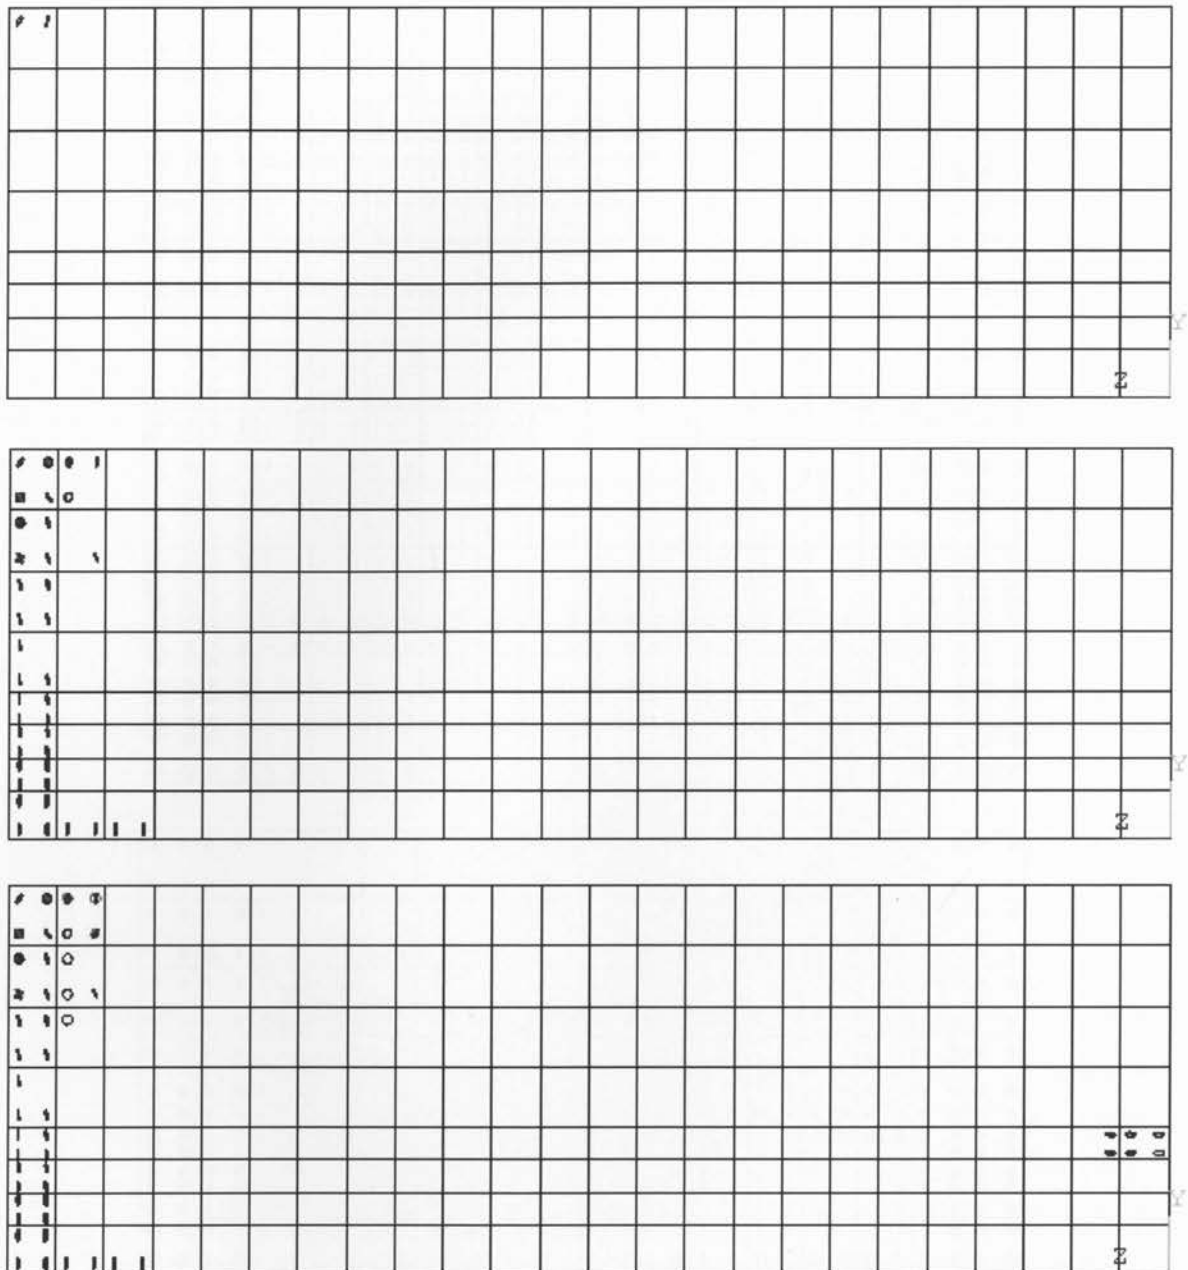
Crack patterns of 3m barrier wall (fix – free) @ 10, 100 & 300 hours
